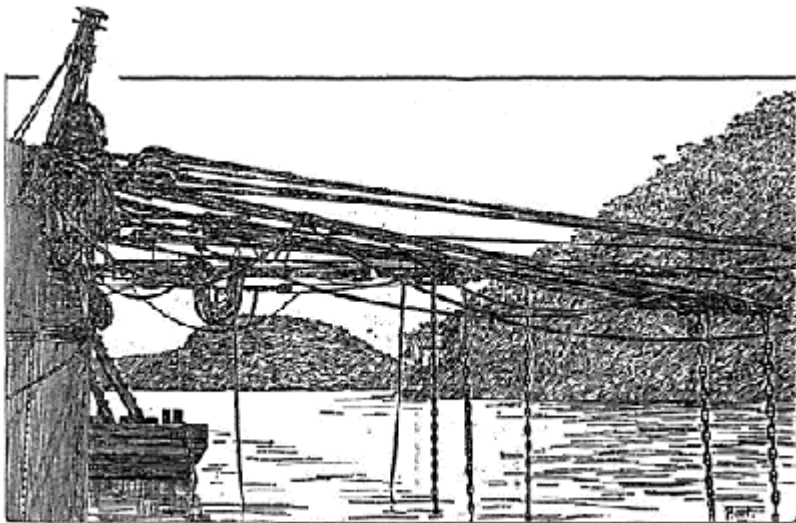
Arrangement to pull top of caisson No. 6 towards shore (Engineering News, 1889a).
